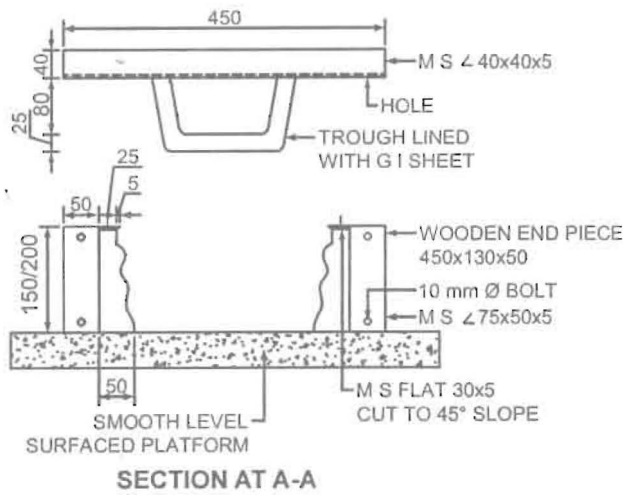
DETAILS OF MOULD FOR CHANNEL UNIT
